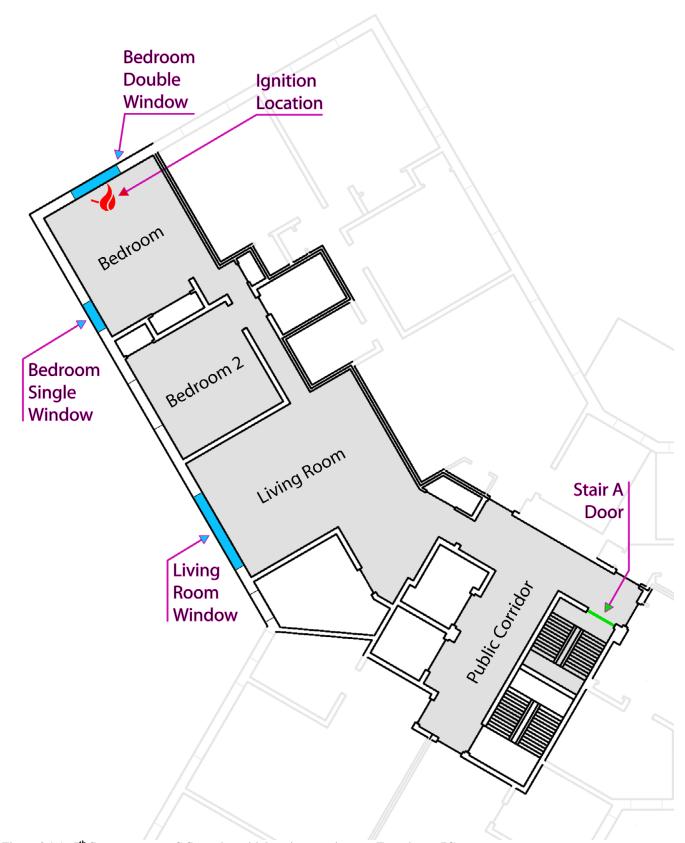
7<sup>th</sup> floor apartment G floor plan with locations pertinent to Experiment 7G
